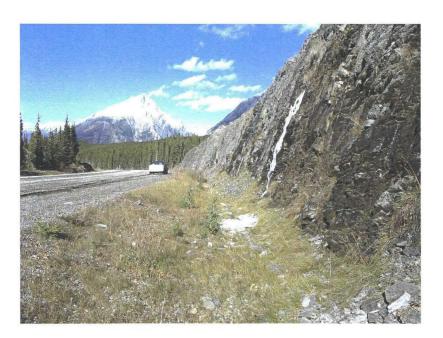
(bottom) – Facing northbound along the east road ditch.
